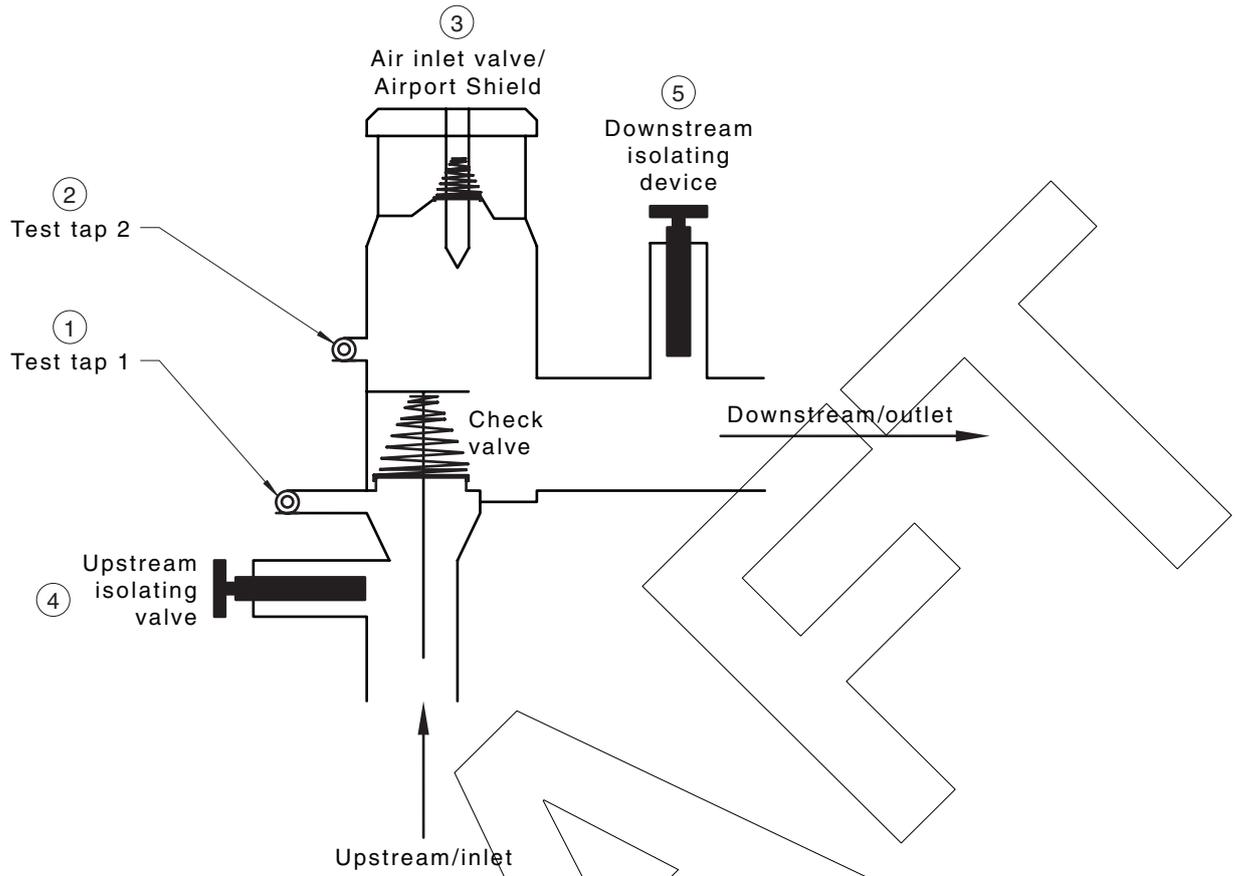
Typical pressure-type vacuum-breaker device test arrangement
